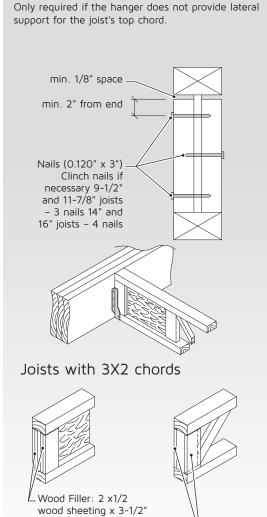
Wood Beam Connections with Hangers Blocking not required between joists for residential * top mount or face mount hangers applications located in low to moderated seismic zones
